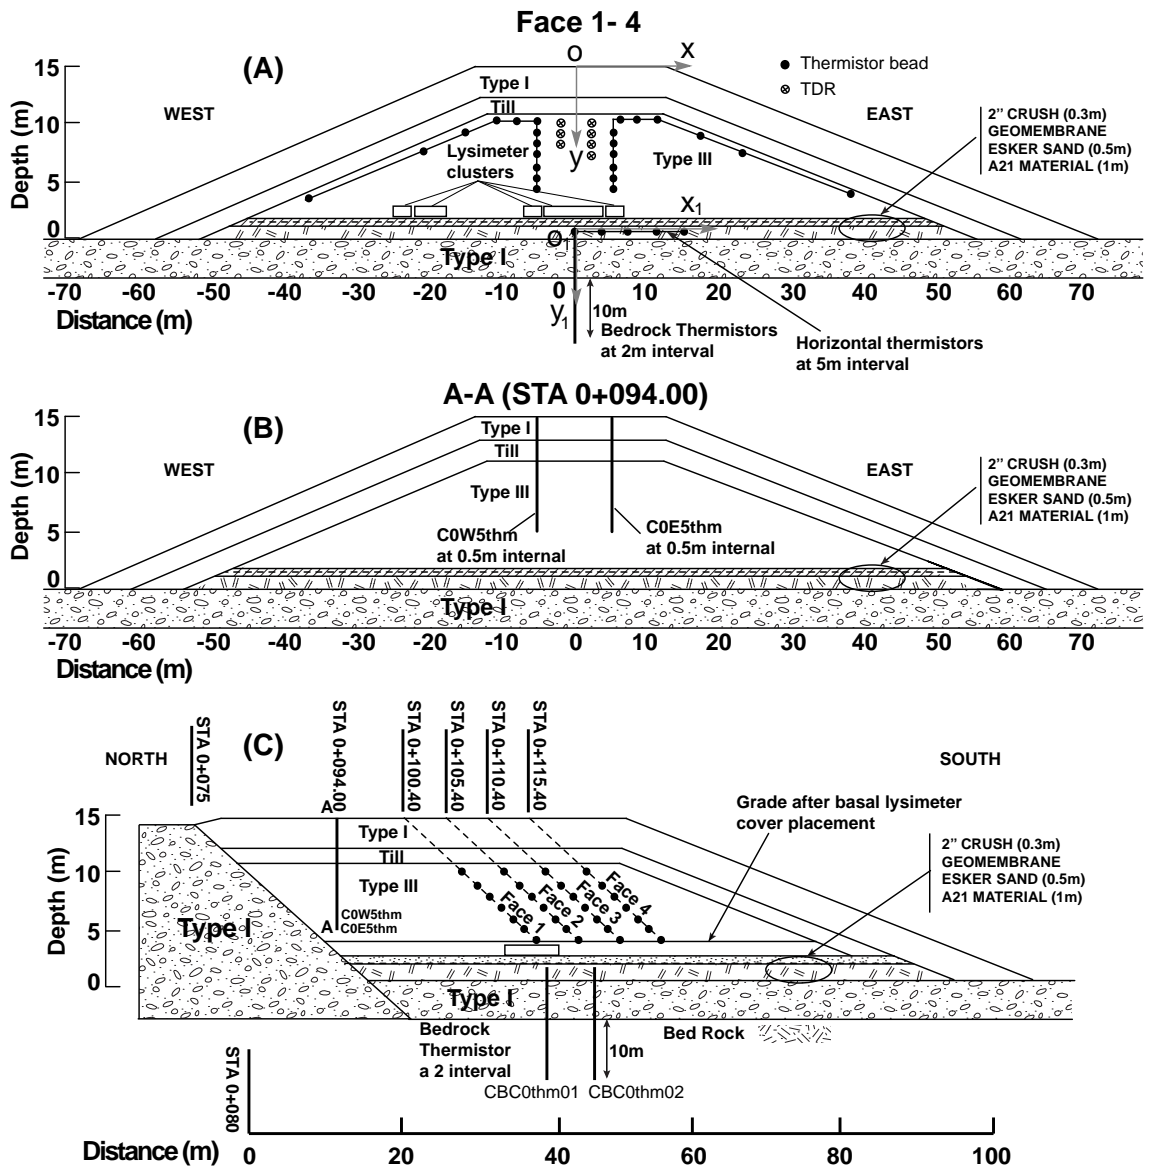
Typical cross-section (A and B) and long section (C) of the covered test pile.
